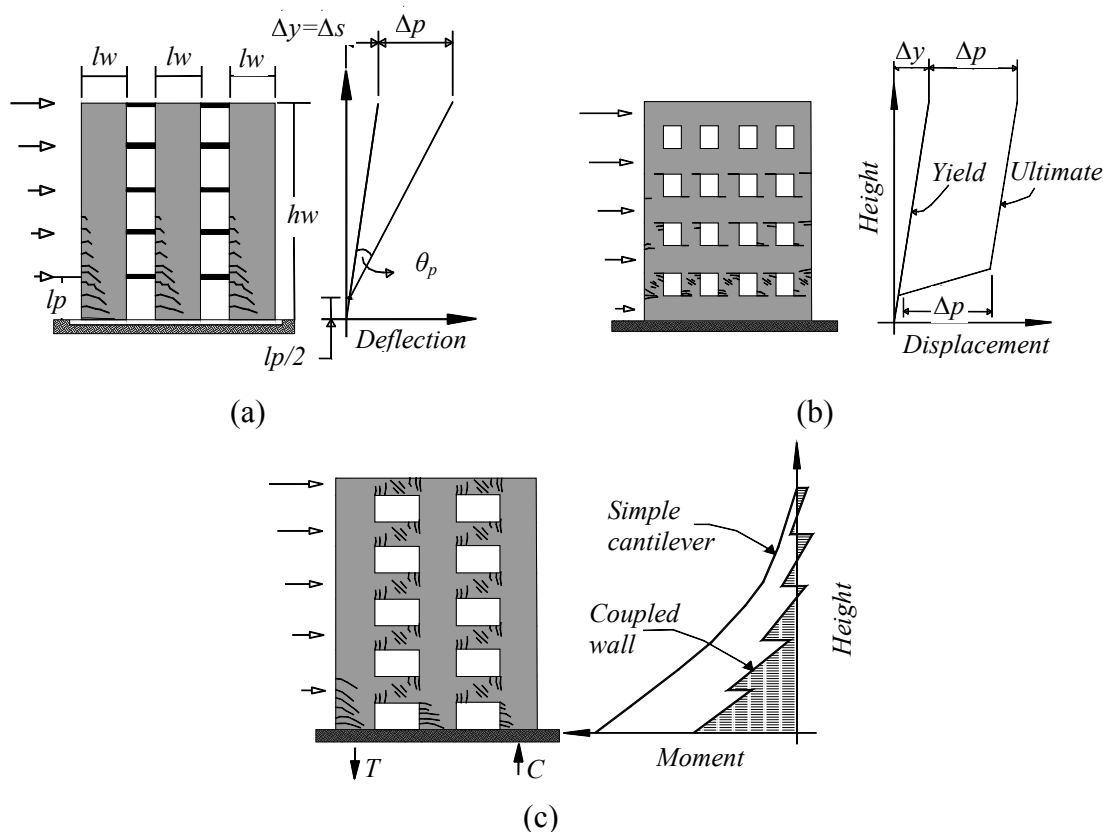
In-plane structural models of masonry walls: (a) cantilever walls connected by flexible floors; (b) coupled walls with pier hinging; (c) coupled walls with spandrel hinging (adapted from Paulay and Priestley 1992).
